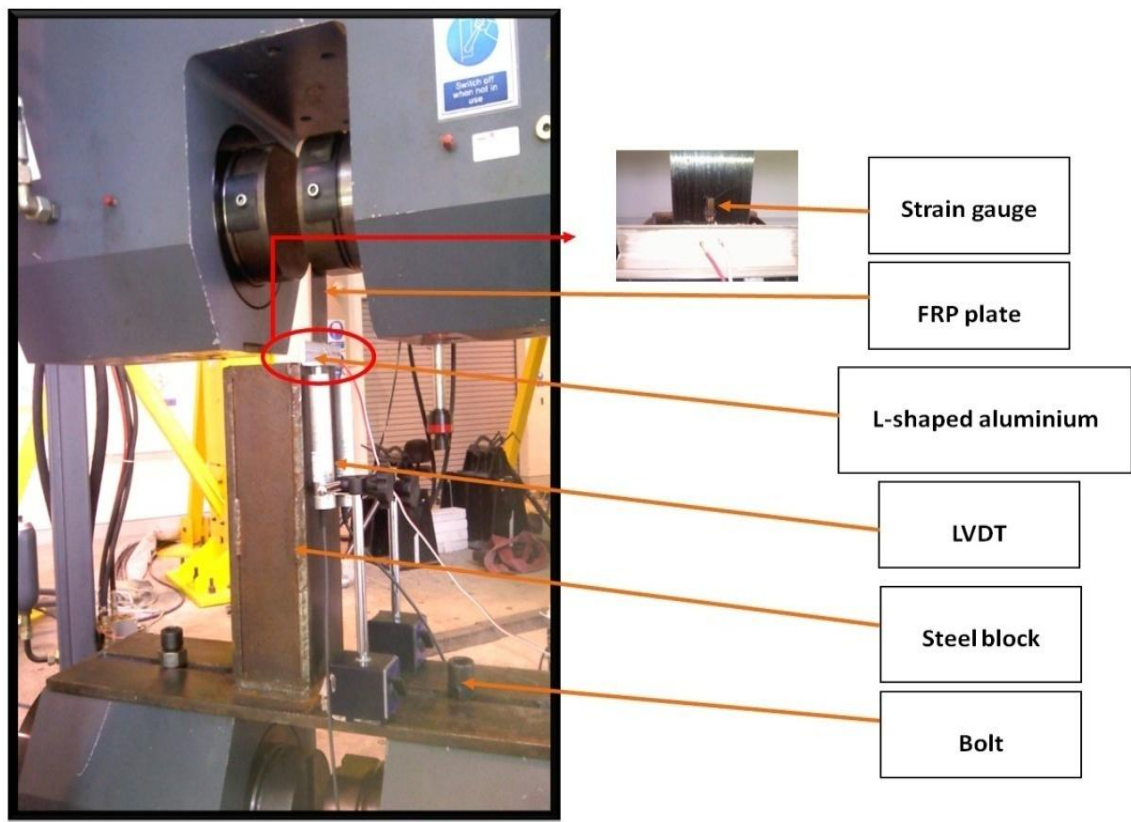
Assembly and configuration of CFRP-plated steel specimen ready to be tested
